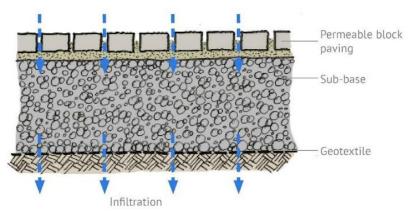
Permeable pavement sketch (Susdrain, 2015)
